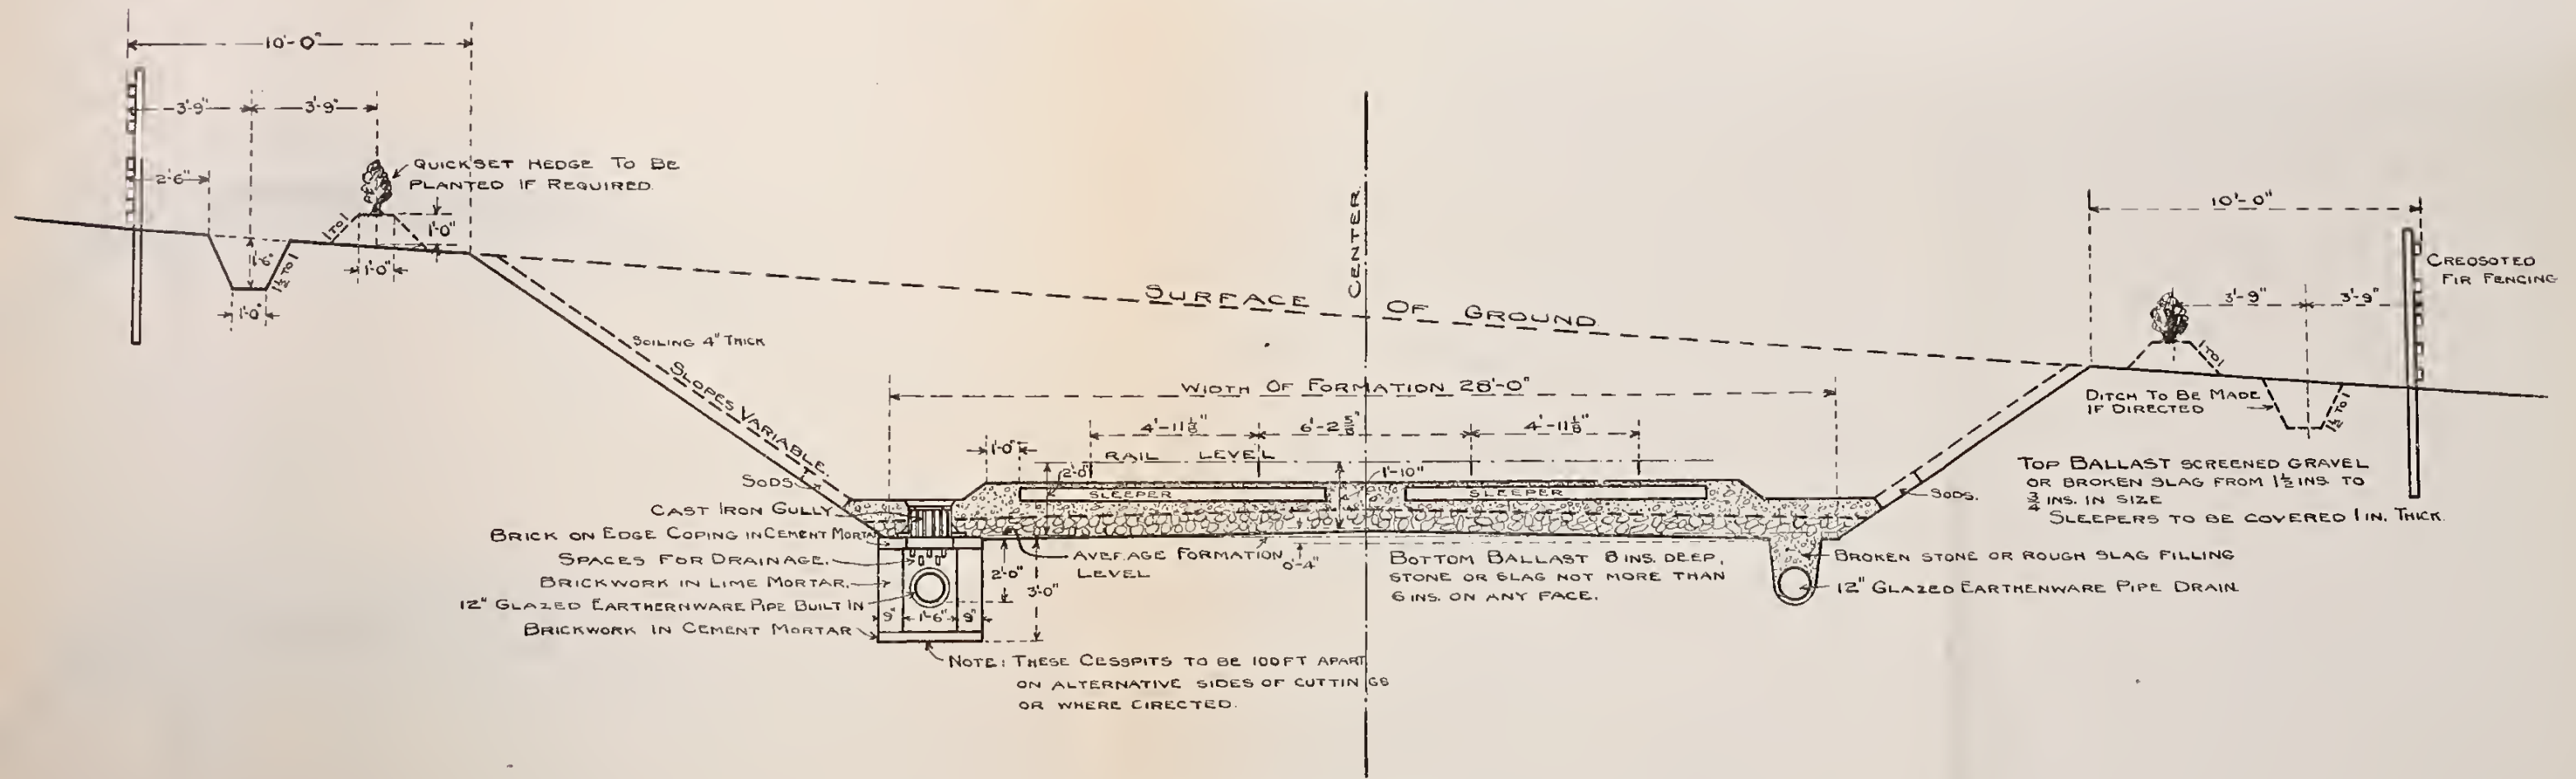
SYSTEM OF BALLASTING, GREAT NORTHERN RAILWAY. SECTION OF CUTTING ON STRAIGHT.
